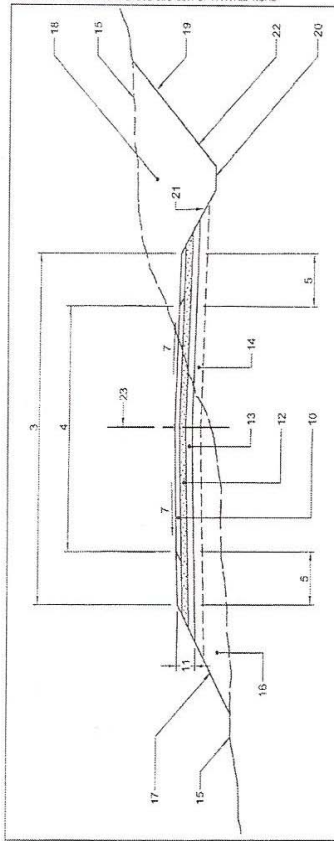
A2: TYPICAL CROSS SECTION OF A PAVED ROAD
